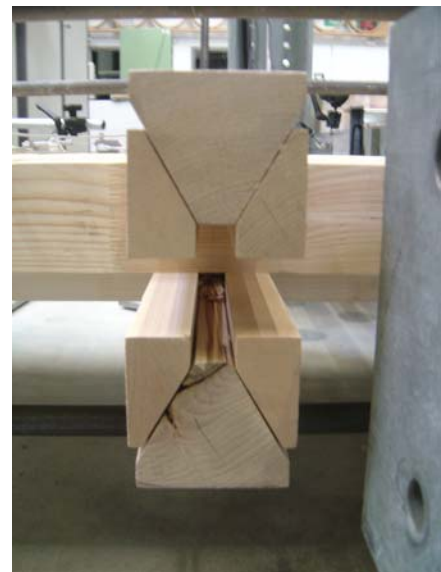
Joint detail "staggered columns – girths" (photo: Shiratori).
